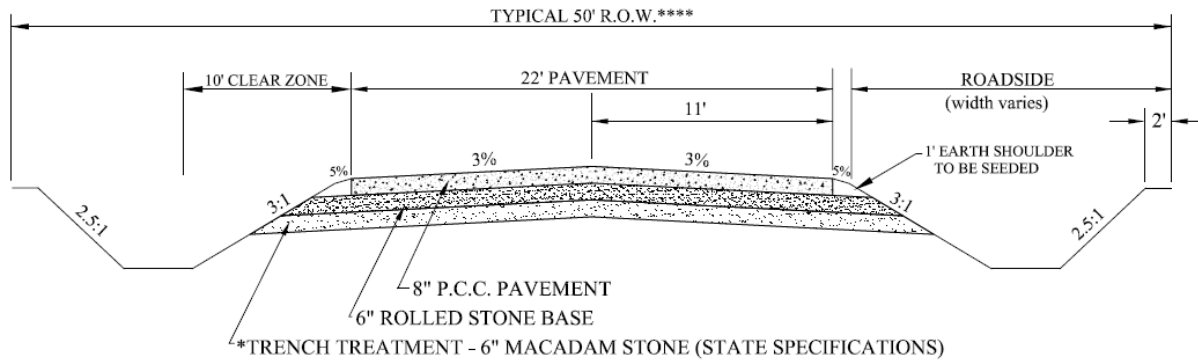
CONSERVATION SUBDIVISION: TYPICAL MINIMUM P.C.C. PAVEMENT - OPEN DITCH SECTION
